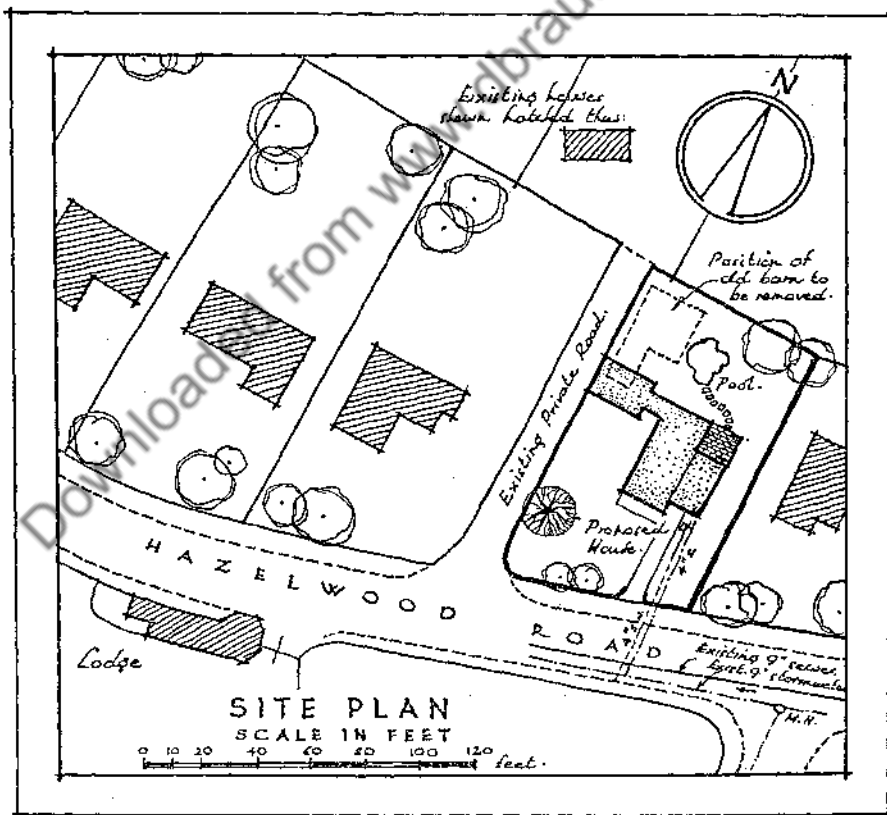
A typical site plan for the small house used to illustrate a working drawing
